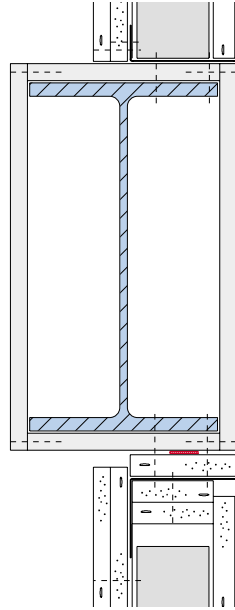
Junction between a column clad with Glasroc FireCase S and a beam clad with Glasroc FireProtect
